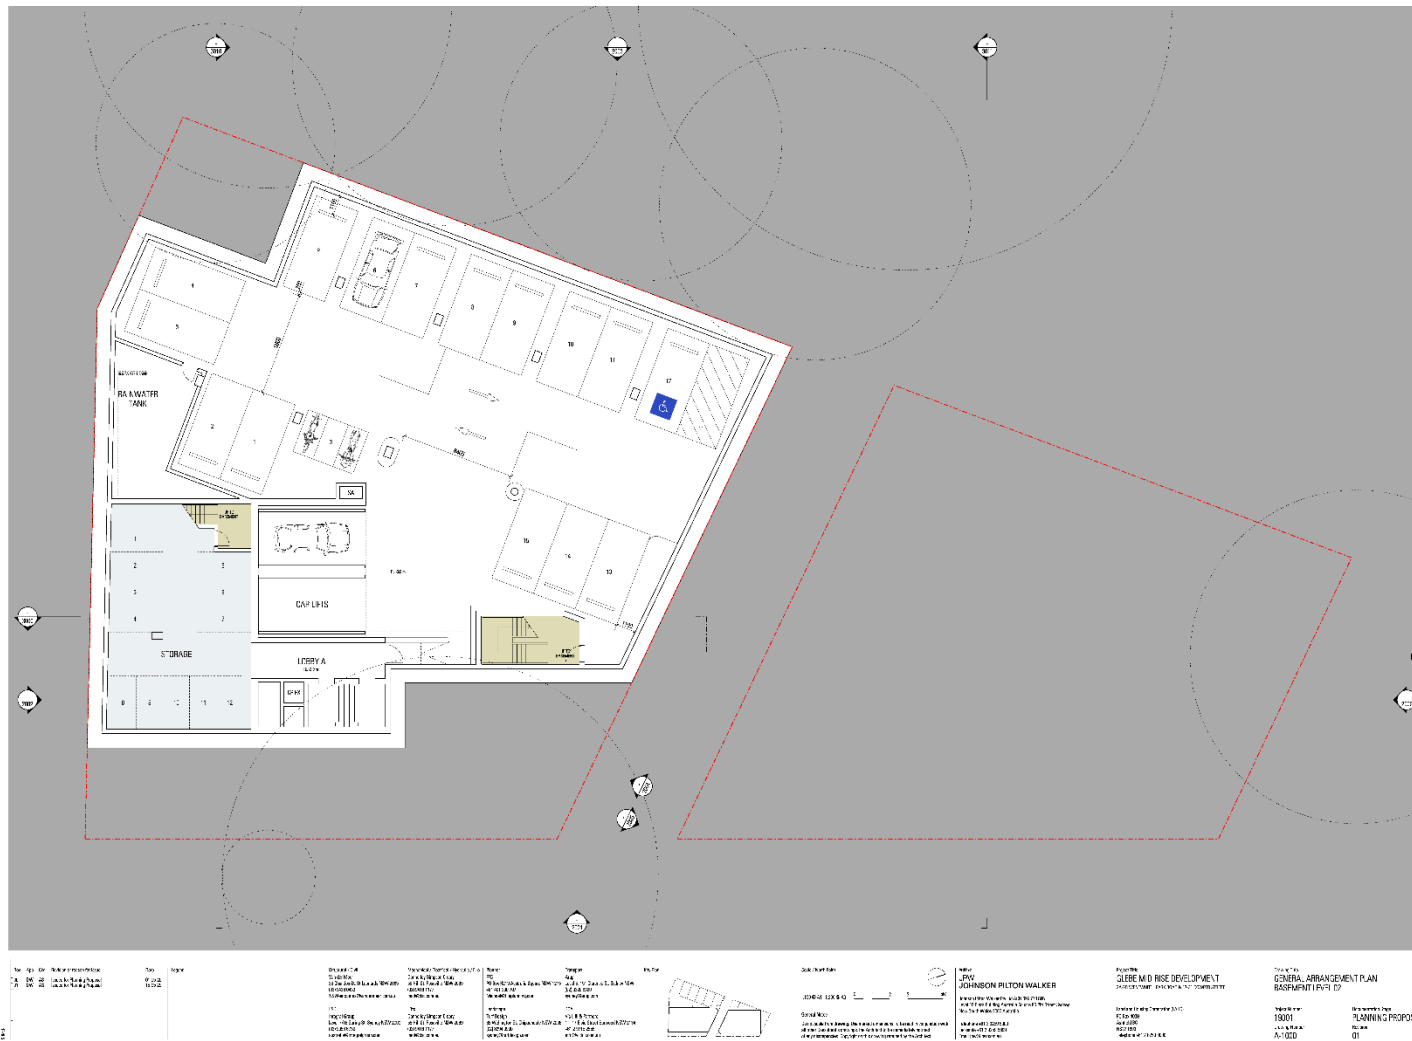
Finalised concept plan of the proposed development, Revision 1 05-15-20. Basement level 2, comprise a carpark at 31 Cowper Street, is shown in this plan (Source: Johnson Pilton Walker 2019).
